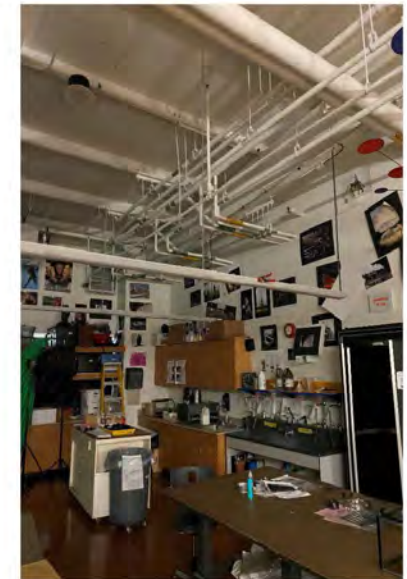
Tech Ed: Classroom area with exposed piping and ductwork.
